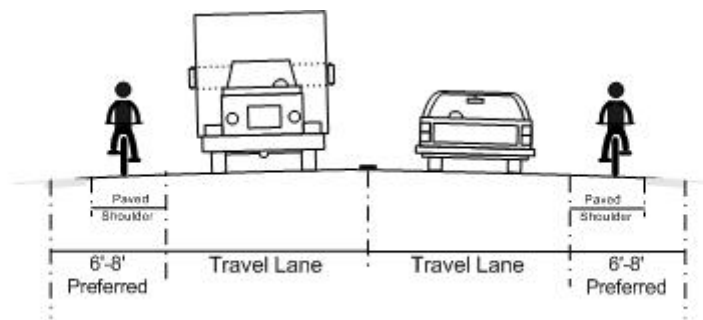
EXAMPLE BICYCLE FACILITY STREET CROSS SECTIONS
